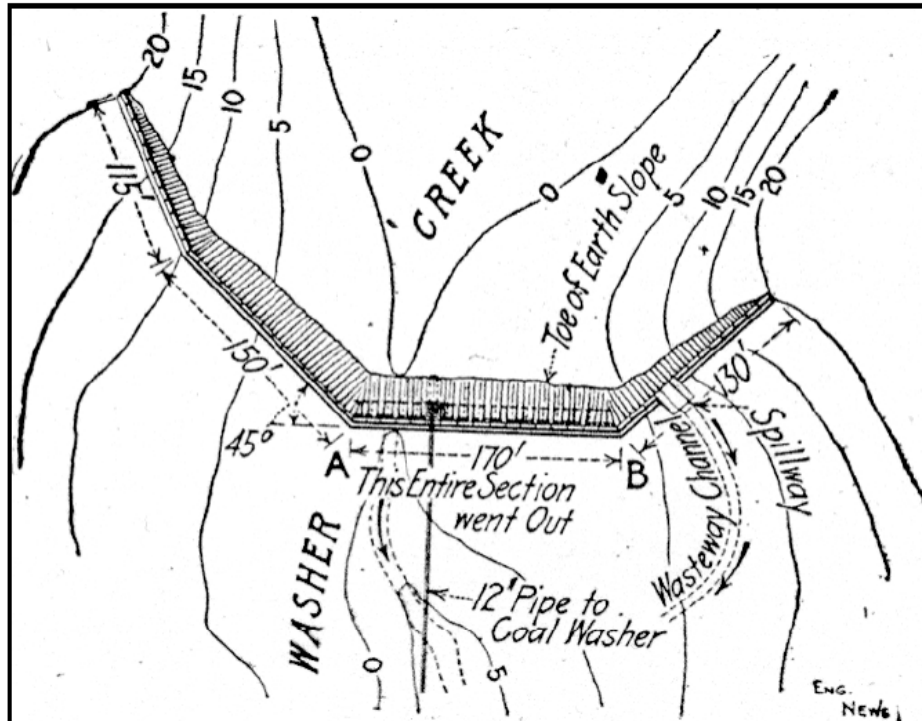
Union Bay Dam Plan View (Mitchell, 1912).
